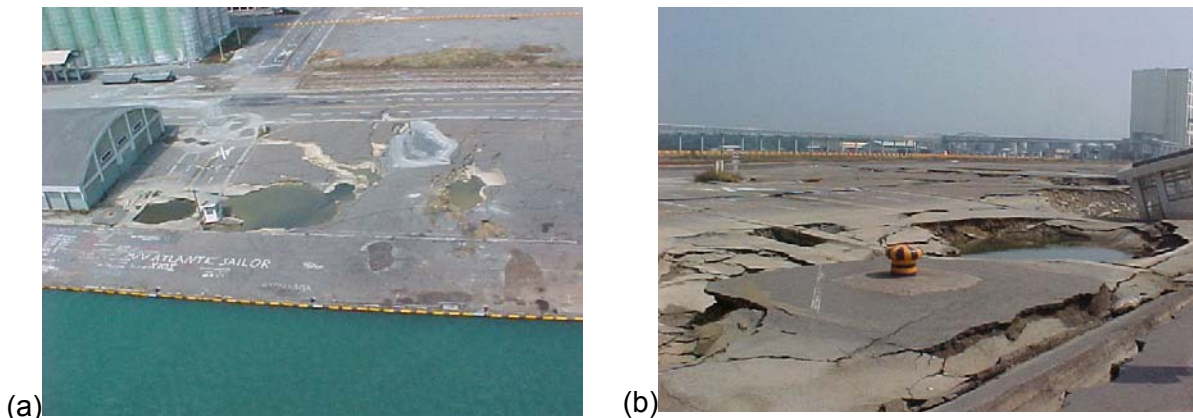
Ground deformation due to liquefaction of apron pavements behind quay walls(a) and pavement damage (b) during the 1999 Chi-Chi earthquake
